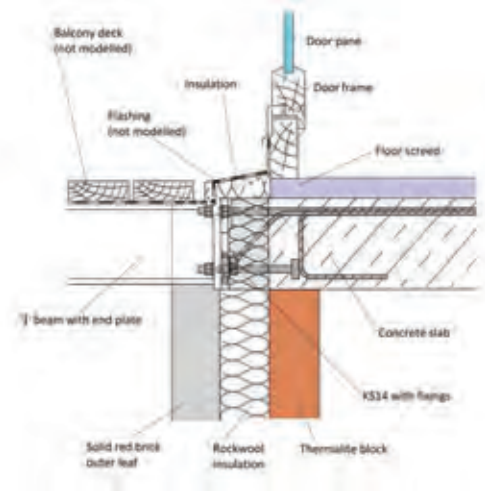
Schöck KS14 unit used with masonry wall and concrete slab
